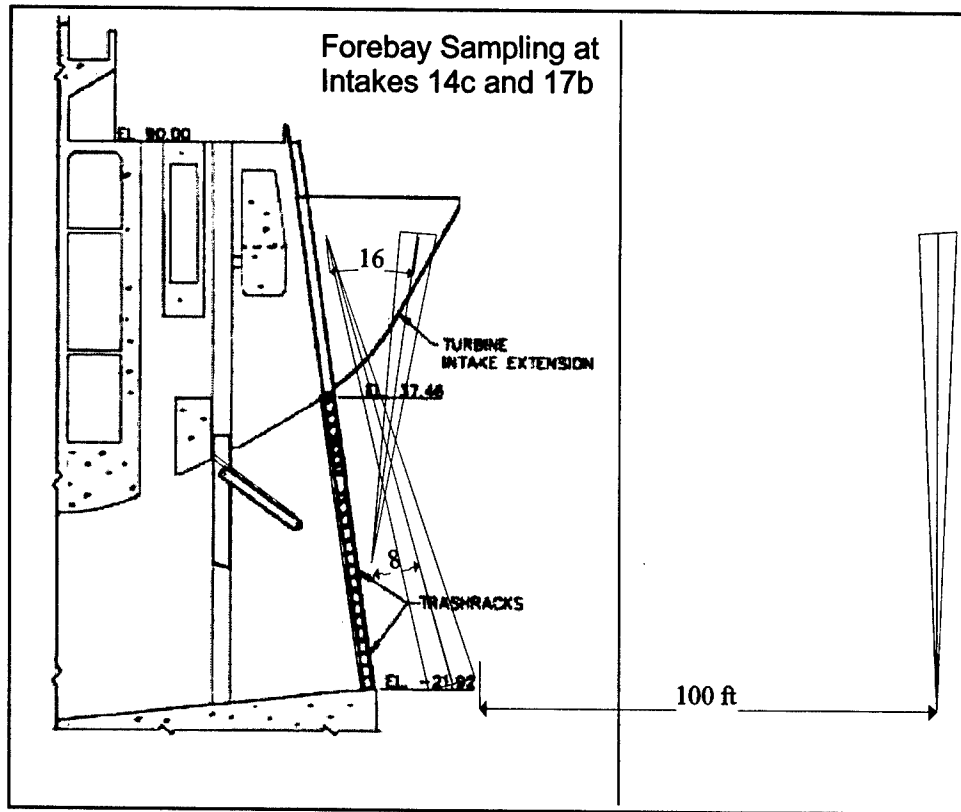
Cross sectional view through intake 14c or 17b at Bonneville Dam Powerhouse 2 in spring 2000 showing an up-looking hydroacoustic beam 100 ft upstream of the turbine intake extension and up- and down-looking beams immediately upstream of intake trashracks
